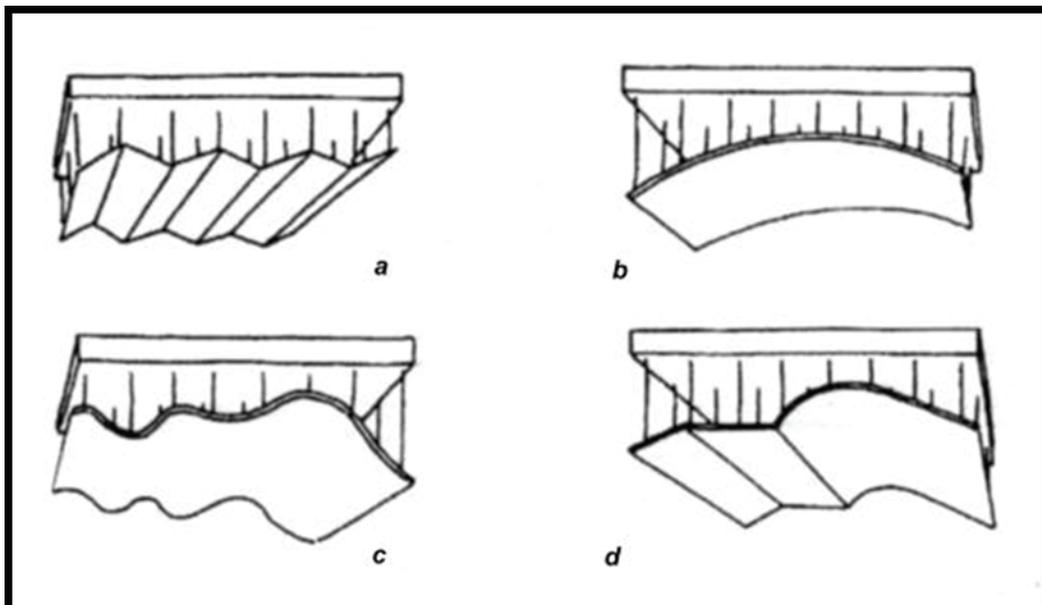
Draft (a), curved (b), corrugated (c) and mixed (d) surface ceilings.
